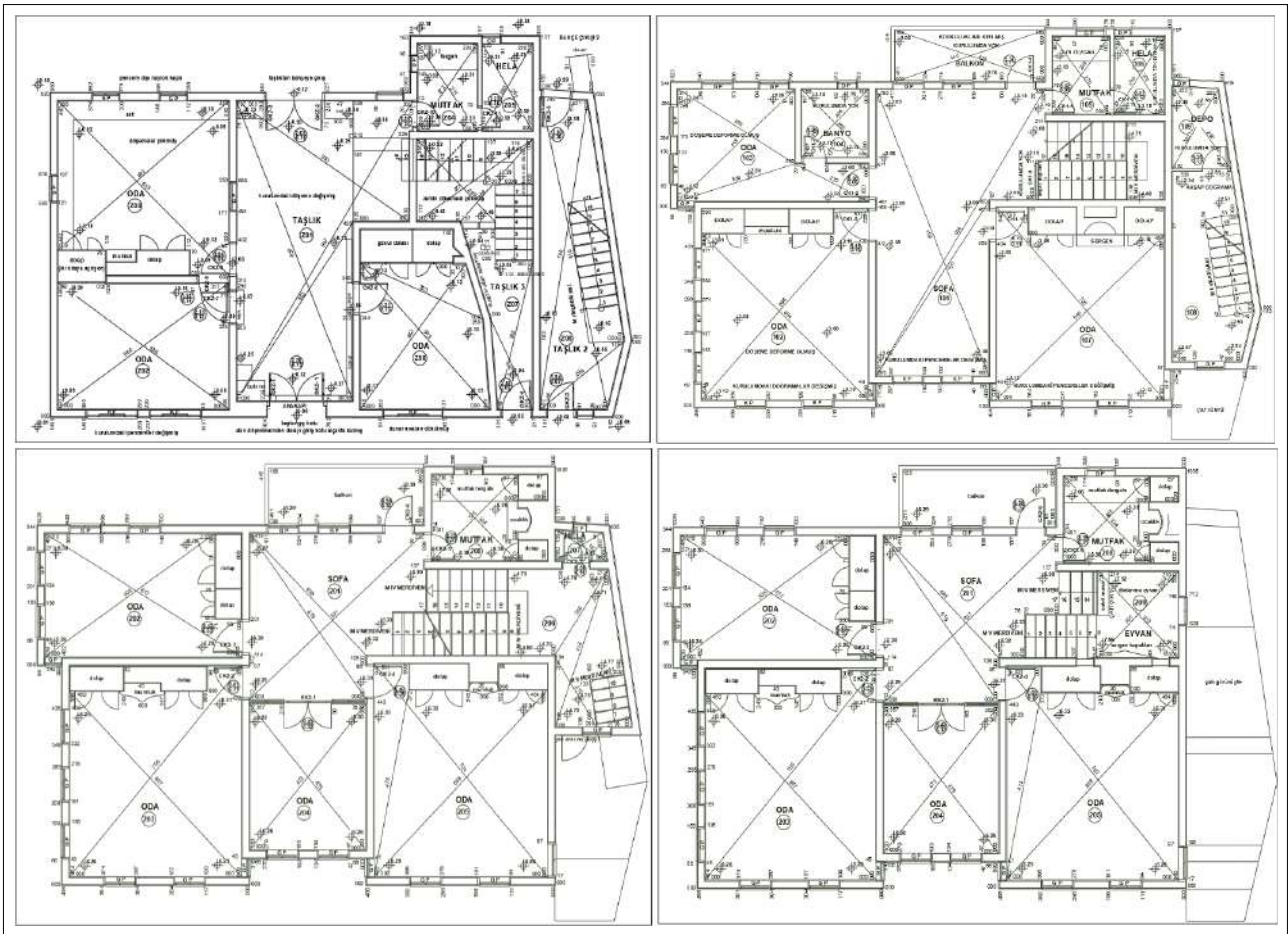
Surveying plans of the ground floor, first floor, second floor, and second iwan floor, respectively.
